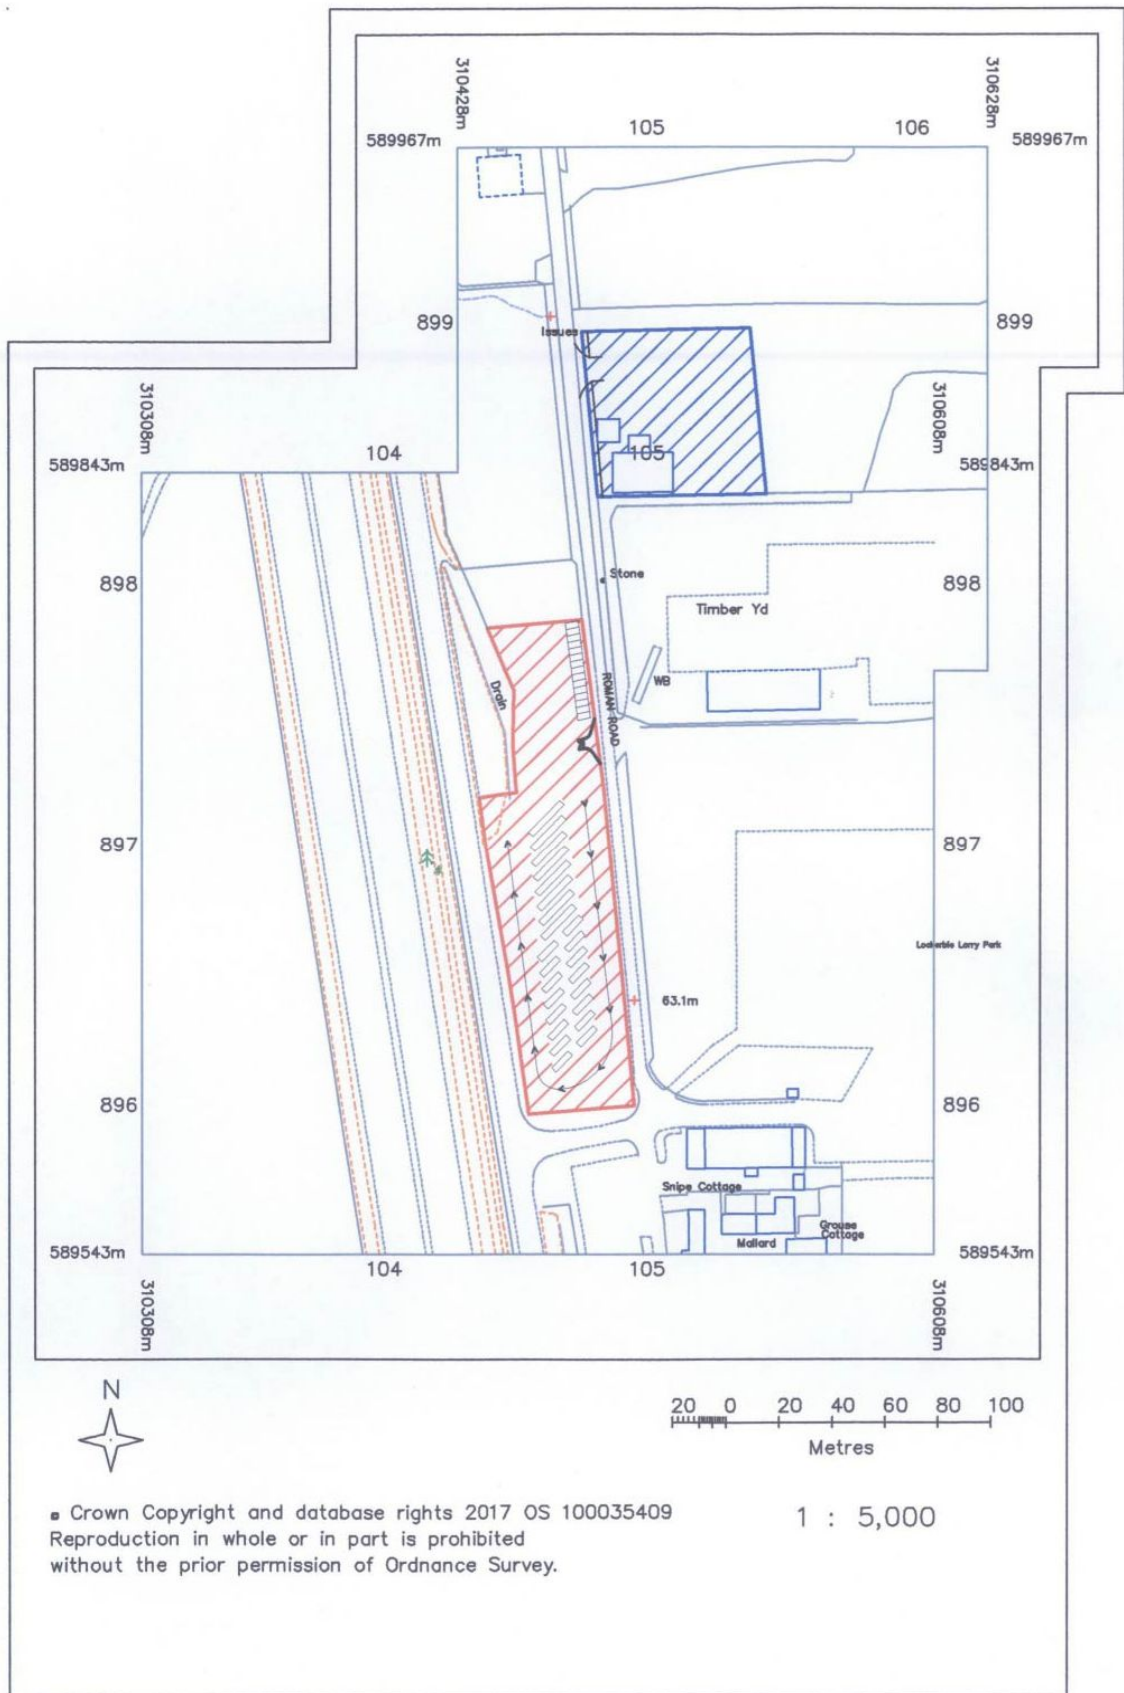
detailed location map (c) Plan B Building Architectural Consultant
